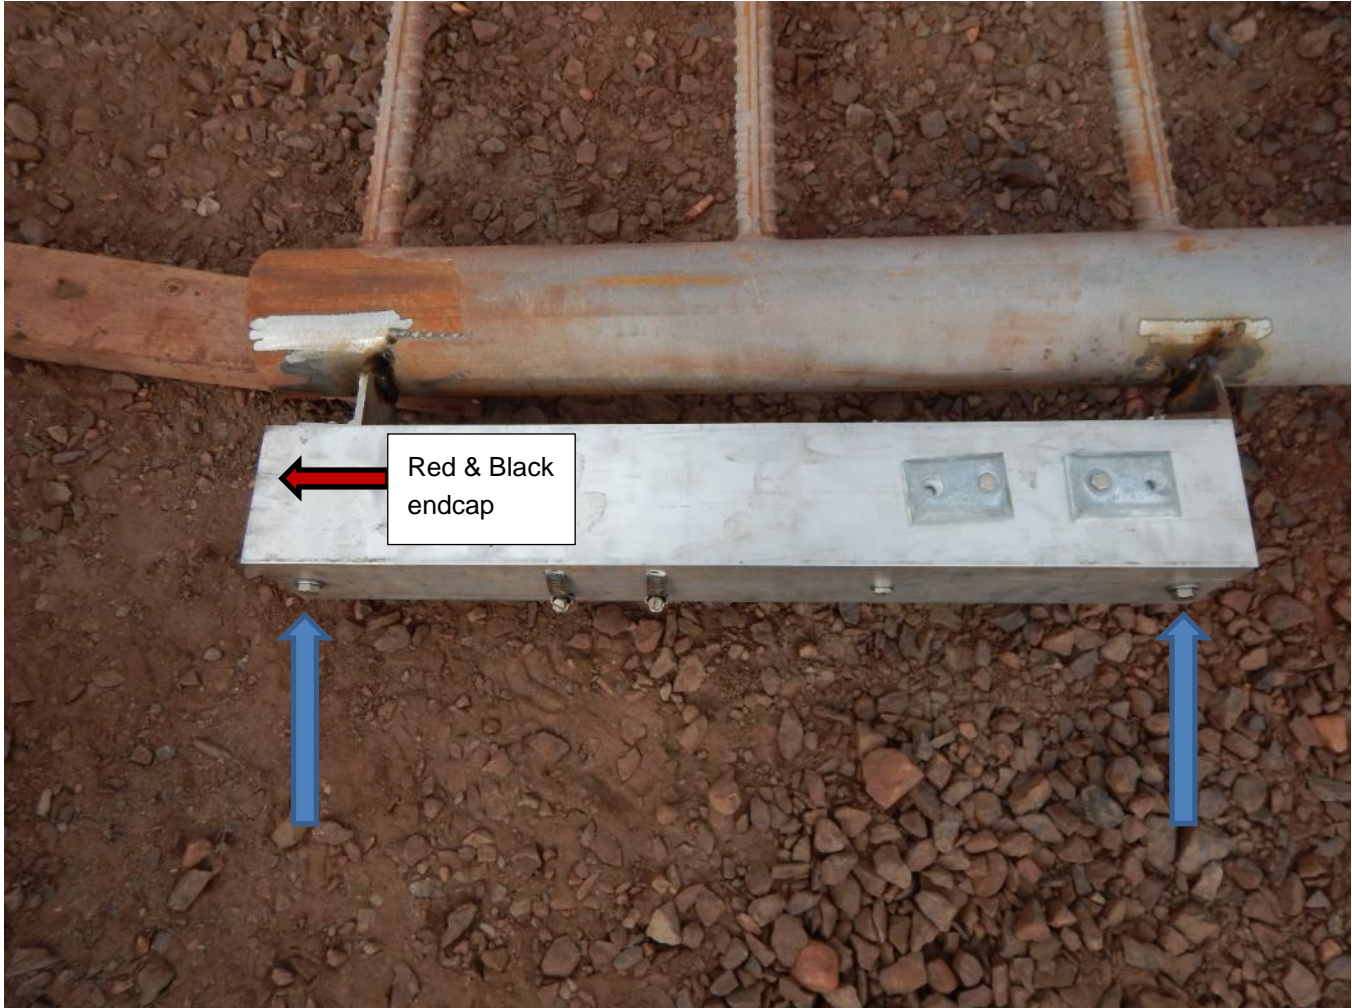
Aluminum square tube mounted to the bottom of the steel ladder located at the ore dock. Arrows show location of mounting bolts which attach the square tube to the welding tabs on the steel ladder.
